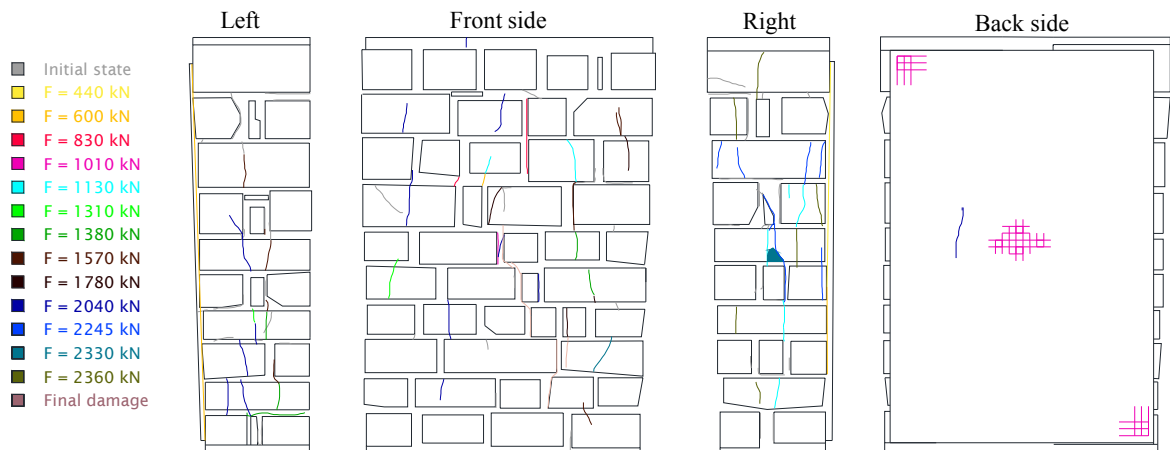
Crack pattern development on the wall with through stones and on the plaster at test TP-visoki
